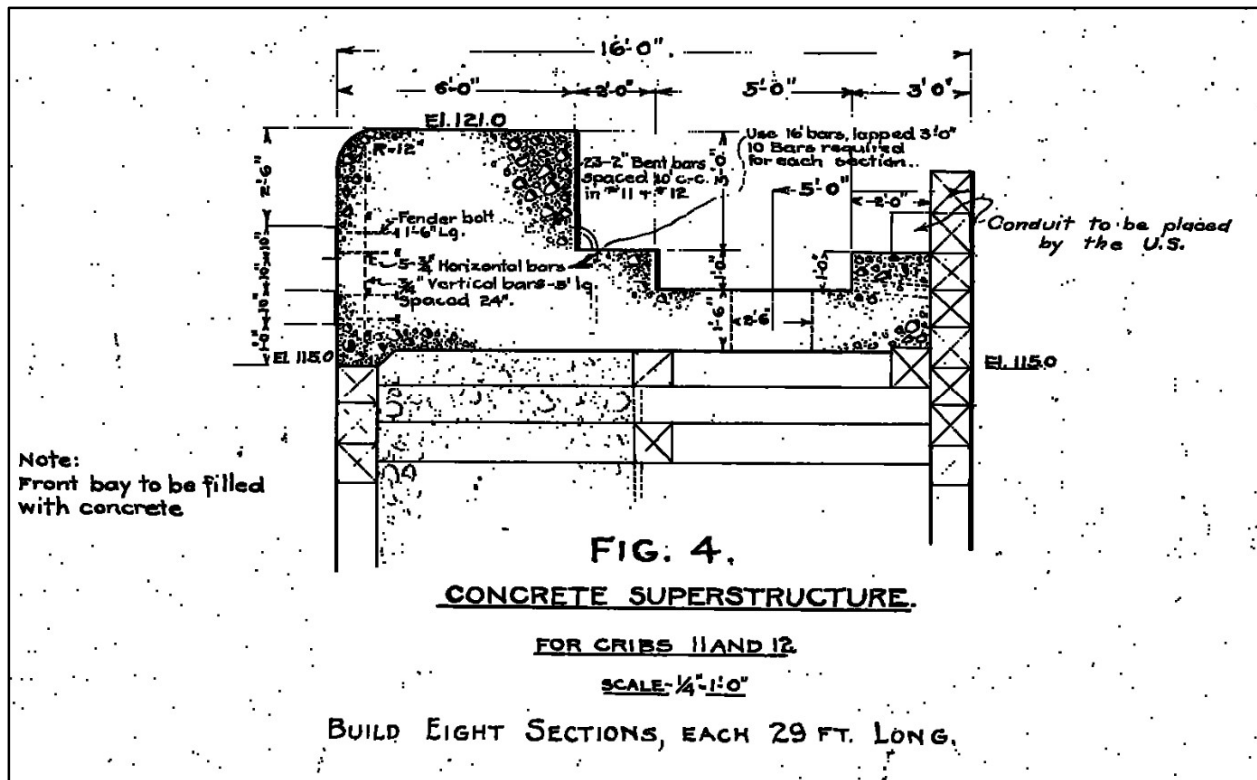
1906 WCP Crib Drawings (Cribs 11 & 12 Typical Section believed to be similar at crib 6)
